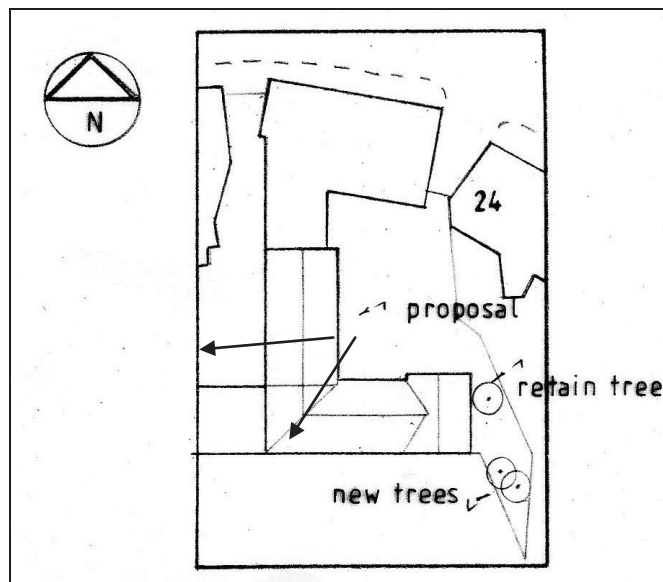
Plan of the site and the proposed layout (plan supplied by client)
